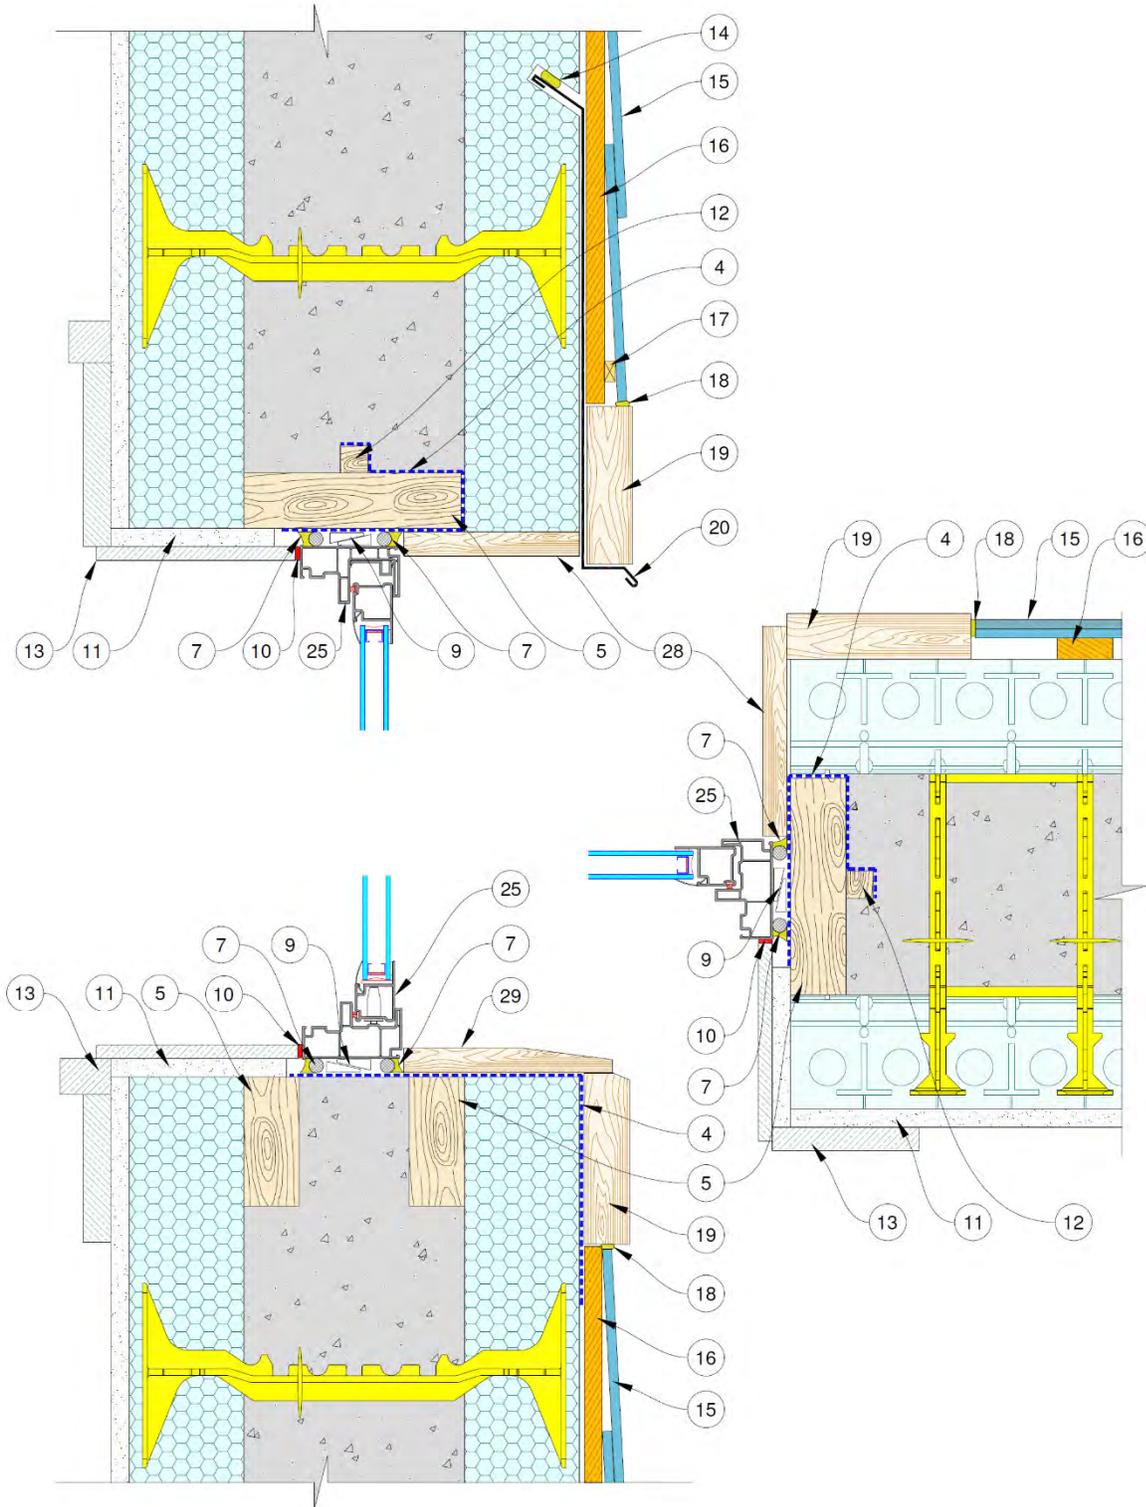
ICF Window Assembly - Wood buck-out, Boxed window centered, Lapped siding
